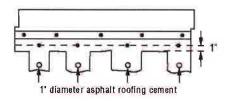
Fastening Presidential and Presidential T/L Sbake shingles on steep slopes.
